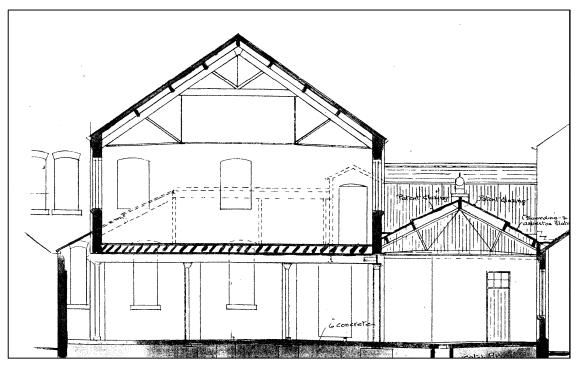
Section through Building S for 1928 proposals (east) showing original roof truss. The single-storey building on the right is for the proposed Dipping House (Building O) to be built in the vacant area between S and M/N. The bridge between M and S/R lies behind the single pitched roof. Ghosted in the background is Building R with the hipped end of the glass-covered roof in the space between Building R and Building S.¹¹
